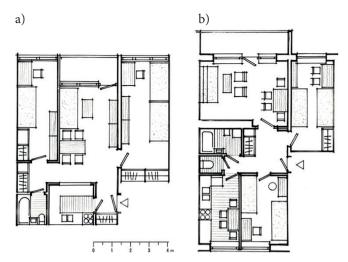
Small, multi-room apartments in Poland built in the 1960s and 1970s: a) an enfilade apartment for a family of 4 with a walk-through room and a dark kitchen from the 1960s and b) a three-room layout apartment for a family of 4 with a bright kitchen from the 1970s
